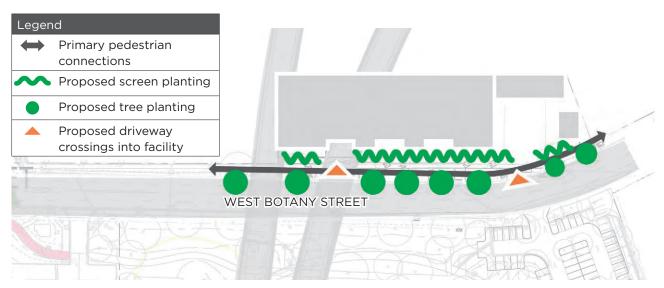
Overview of ventilation facility at West Botany Street urban design and landscape elements
